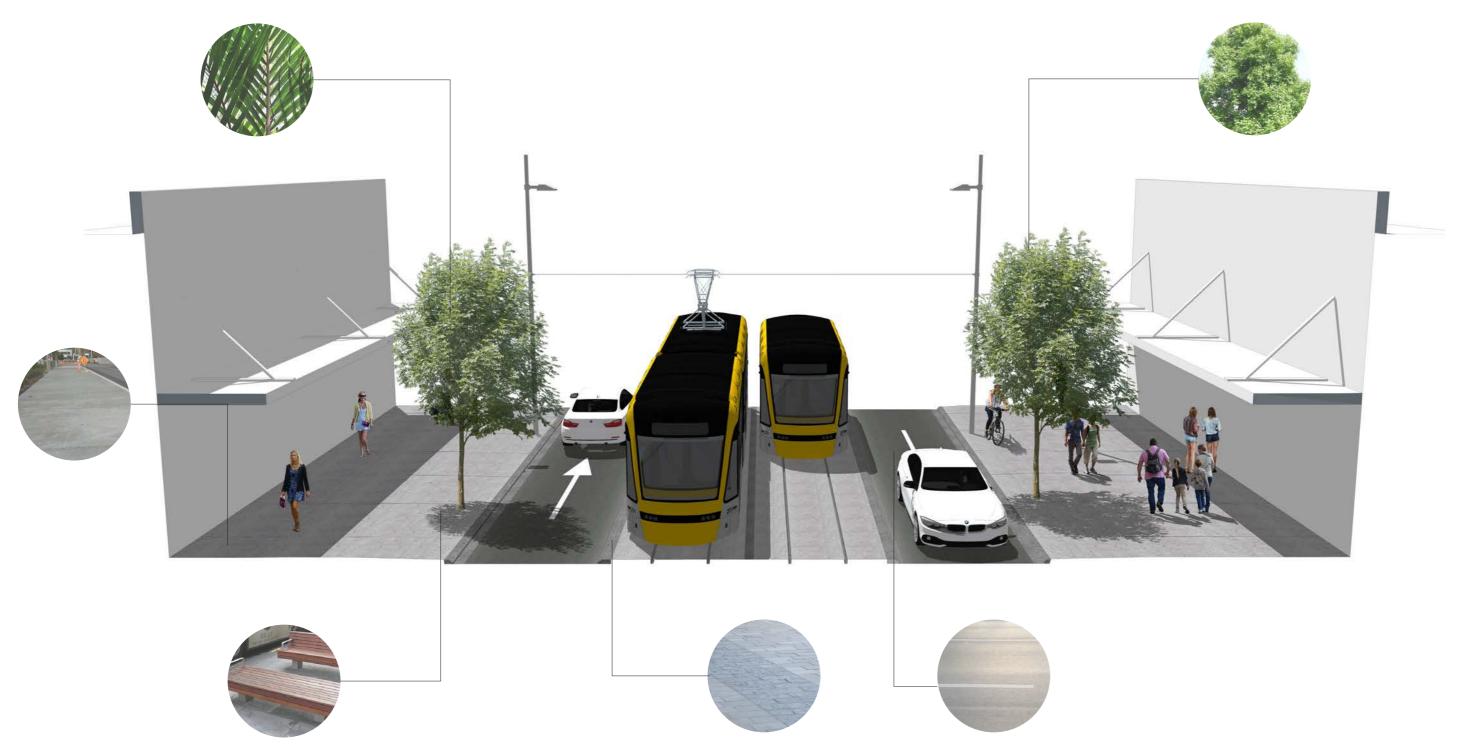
Sectional Perspective of existing Upper Queen Street with LRV carriageway and indicative streetscape treatments. Existing significant street (Liriodendron) street trees retained. Existing footpath widened on both sides by 1500mm.
